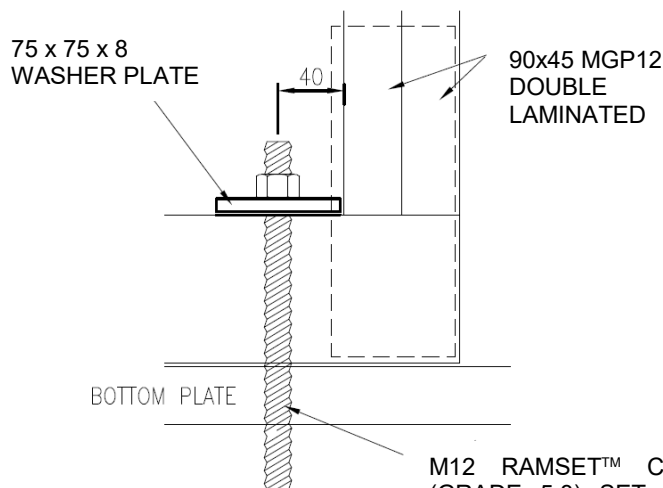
Details of Alternative Tie-Down Anchor. Fixing to concrete is similar to previous
